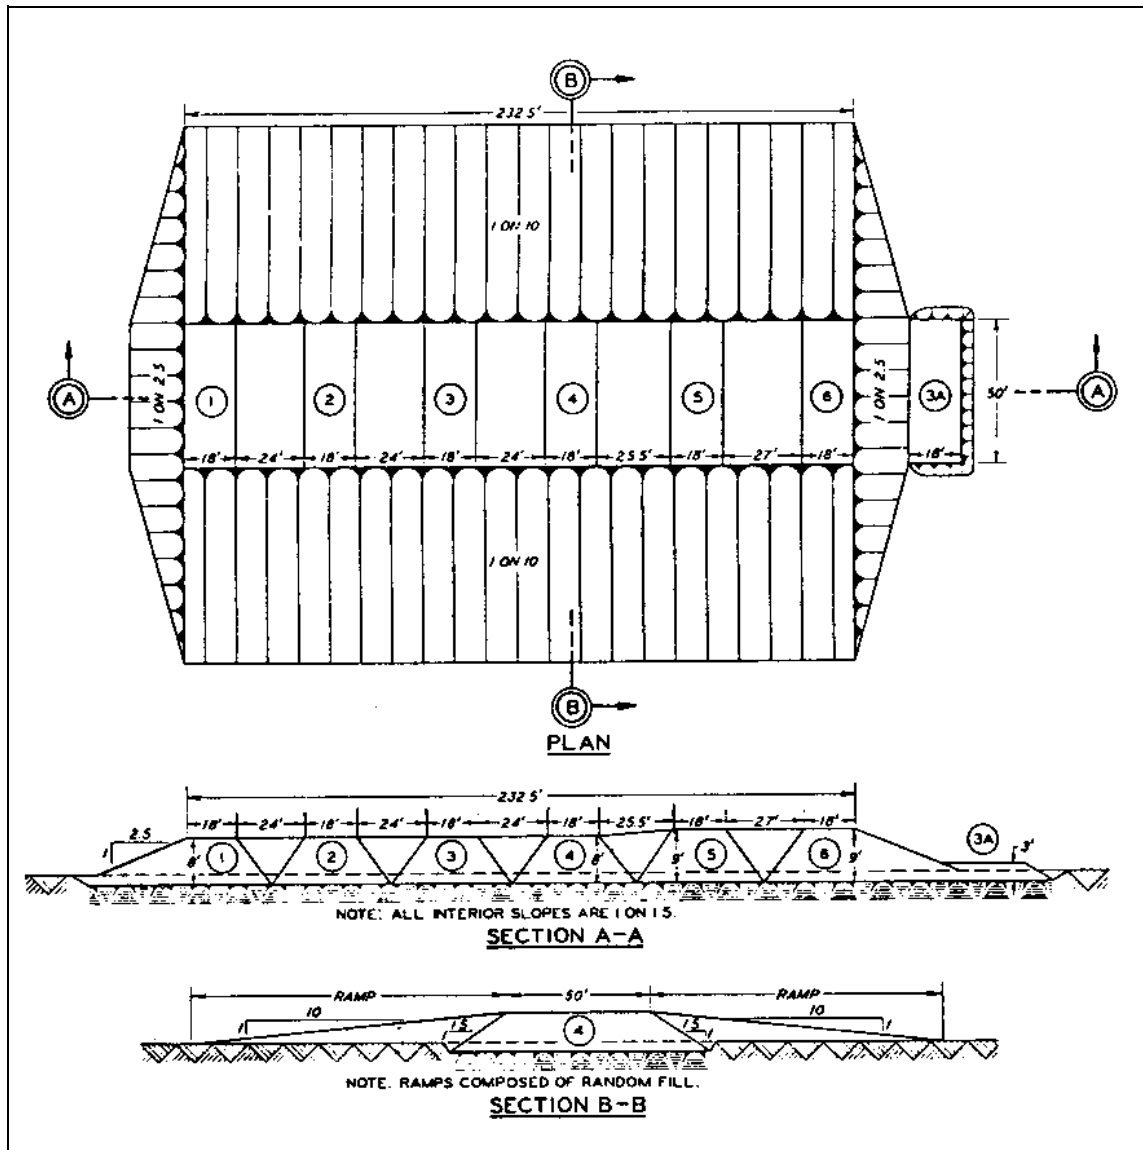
Gilham Dam, plan and profiles of the test fill
